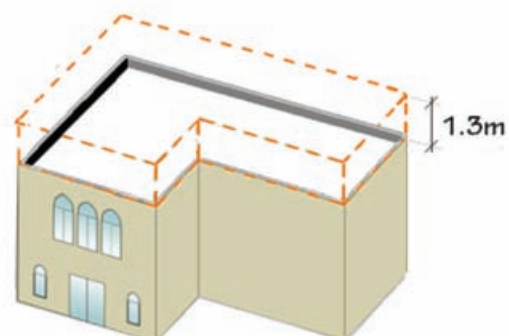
Typical House 2 Virtual RWH Roof Reservoir
